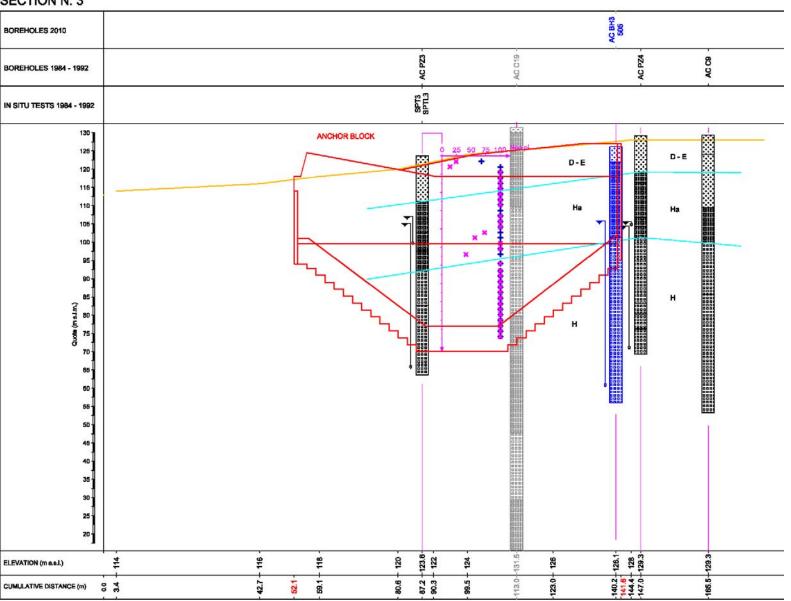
Calabria Anchor Block, longitudinal section (Section No. 3)
